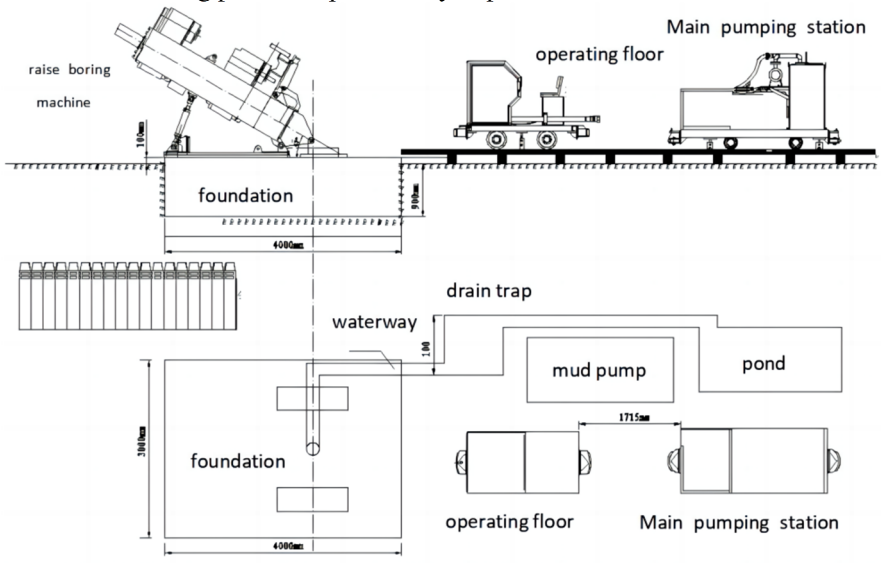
Layout plan of the construction site of the reverse well drilling rig
